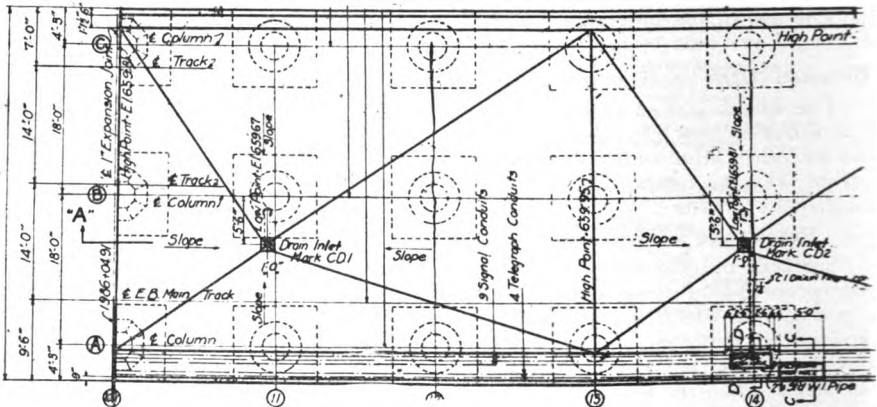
GENERAL PLAN OF DRAINAGE OF AURORA TRACK ELEVATION.
